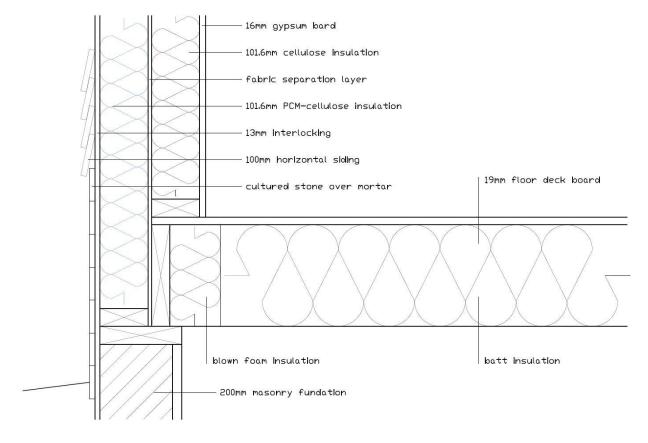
Oak Ridge PCM-House, outer wall section detail (Kośny 2015)
